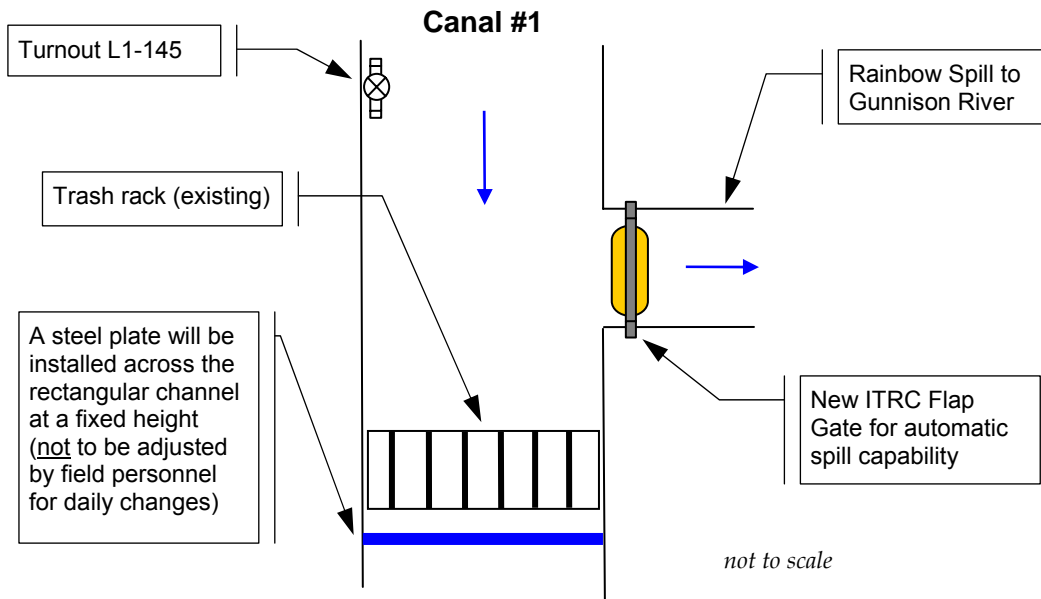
Schematic of proposed modifications to Canal #1 at the Rainbow Spill
